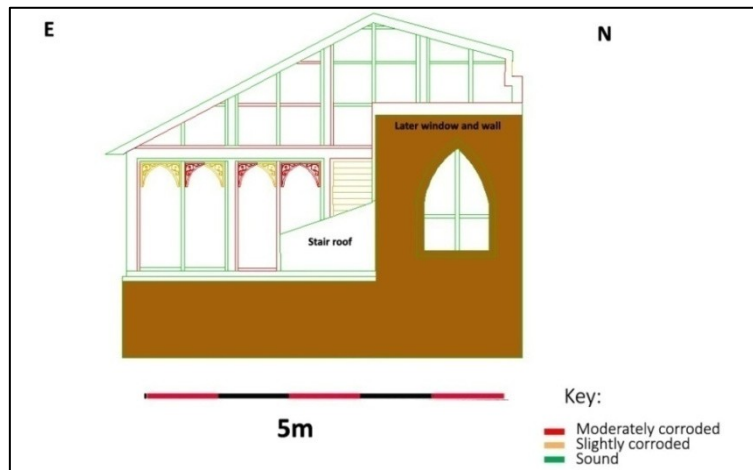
Colour coded elevation drawing of a glasshouse with partial brick walls.
